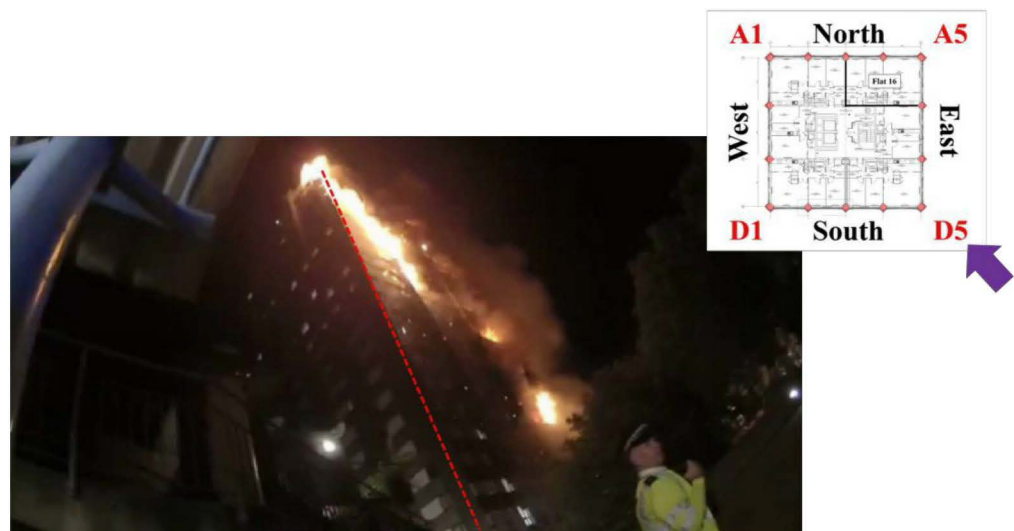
Diagonal flame front along External Flame Spread Route 2, that is, around column D5 (southeast corner of building), from East elevation to South elevation of the building envelope at 02:33 on 14 June 2017 (MET00012593) (SEA00010474)
